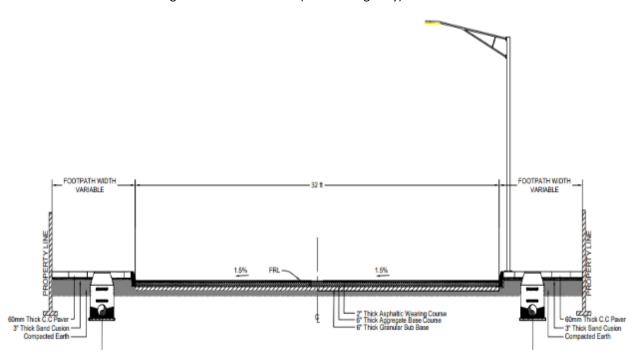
32' Wide Road (Single Carriageway) Cross section
